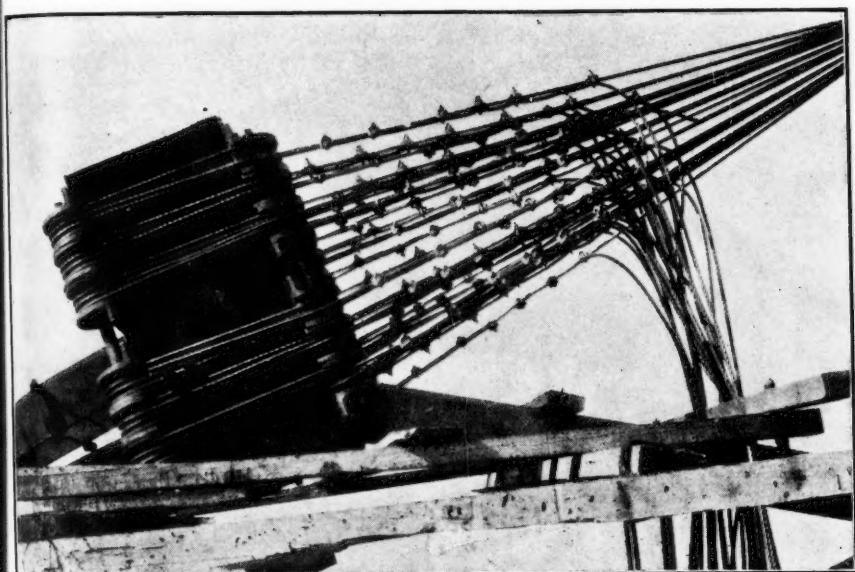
CLAMPING OF TWENTY-FOUR ERECTION ROPES AROUND ROPE GIRDER, FLORIANOPOLIS BRIDGE.
